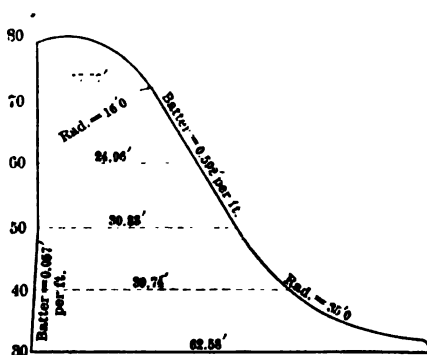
Overfall Section, Spier Falls Weir, New York.
